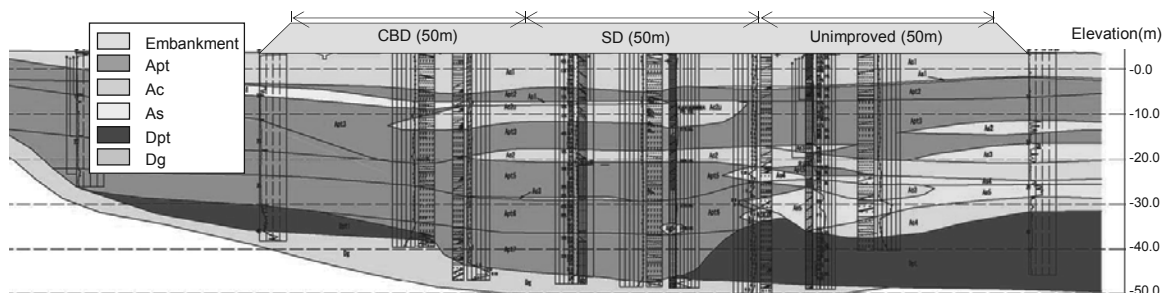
Schematic of test embankment and underlying soil strata (longitudinal cross section).
